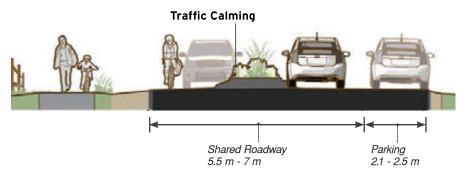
Typical shared roadway widths. At intersections, neighbourhood traffic circles can also narrow roadway width and reduce vehicle speeds. Image from the FHWA Small Town and Rural Multimodal Networks Design Guide.
